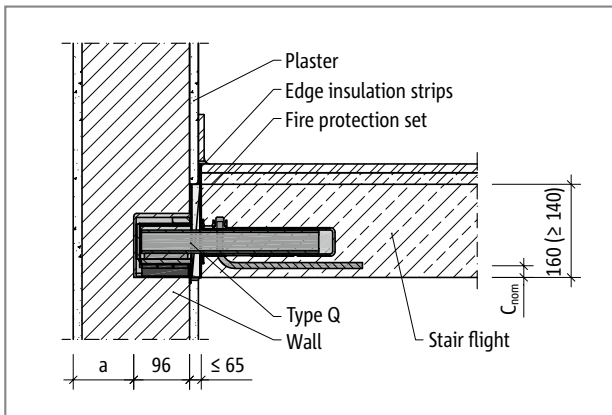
Schöck Tronsole® type Q: Fire protection configuration
